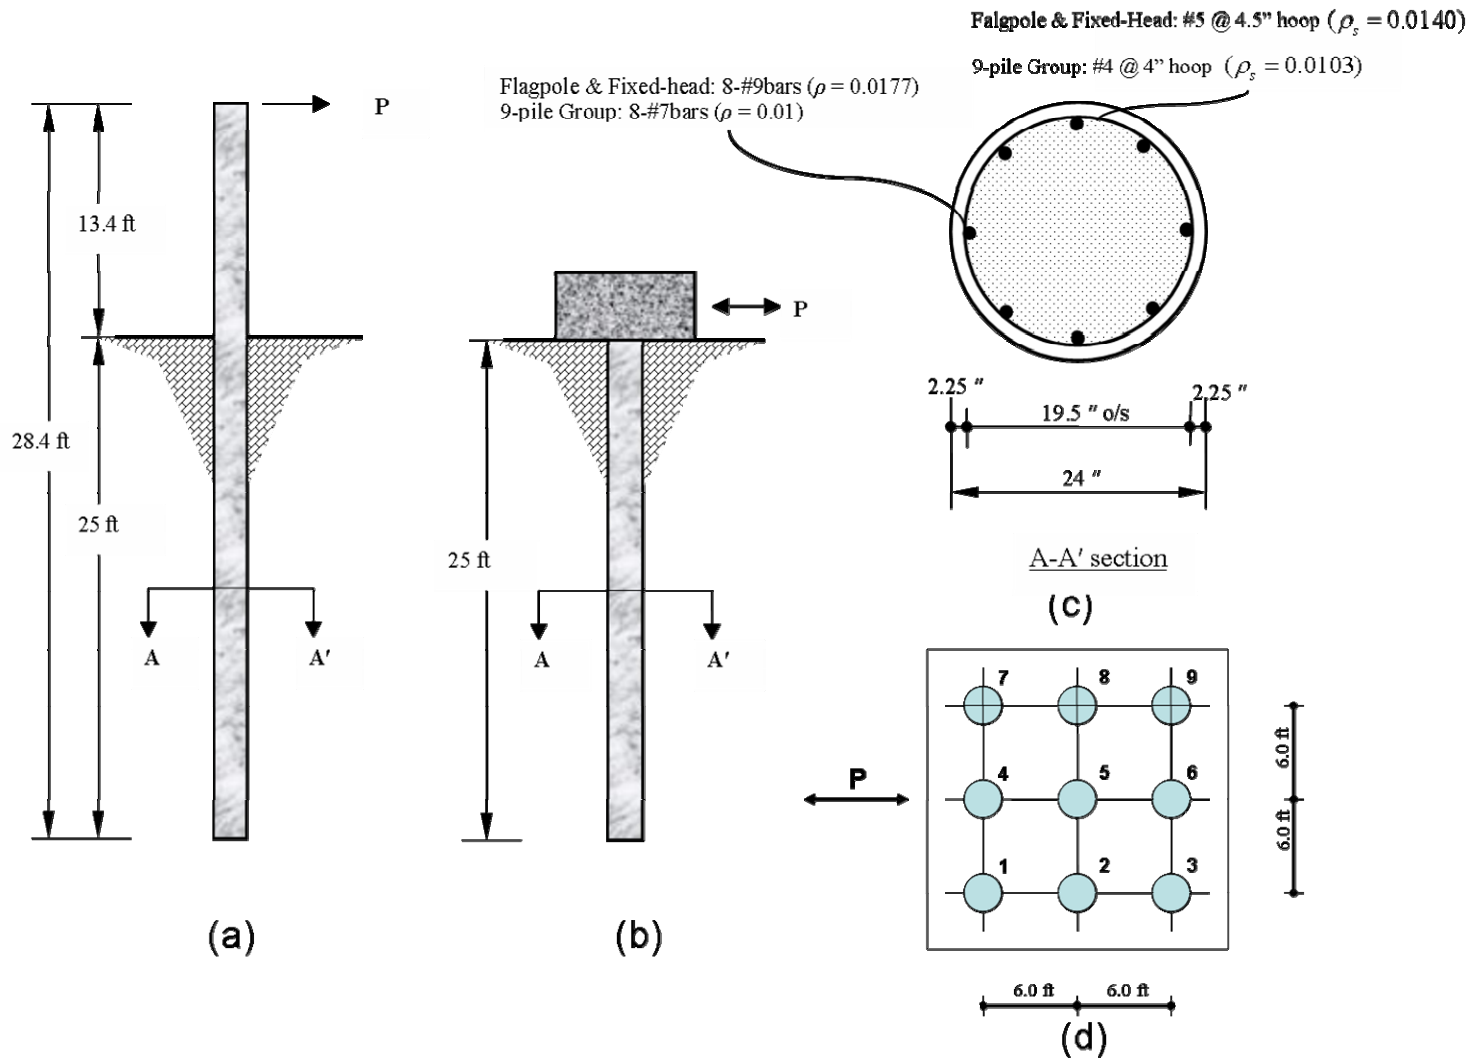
Configuration of the test specimens: Loading and geometry of the (a) flagpole shaft, and (b) the fixed-head shaft or the group piles; (c) Cross-sectional geometry and reinforcement of all specimens; (d) The plan view of the 9-pile group.
